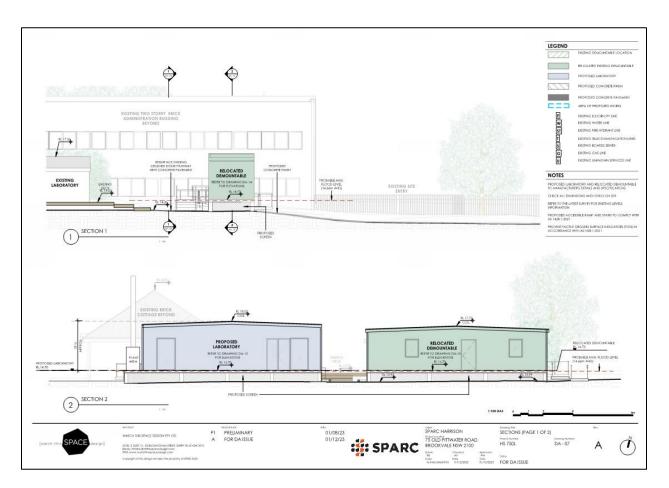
Proposed Sections (Source: Watch This Space Design Pty Ltd, December 2023)
